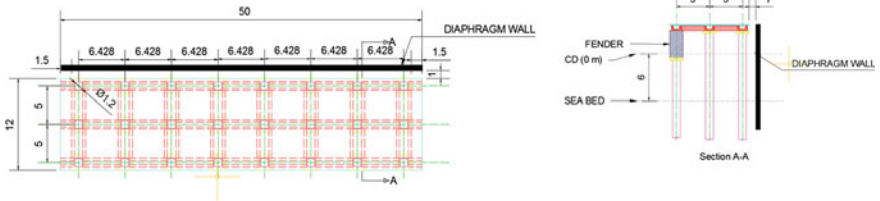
Plan and elevation of Type 2 structure (diaphragm wall separate from the jetty structure) (all dimensions in “m”)
